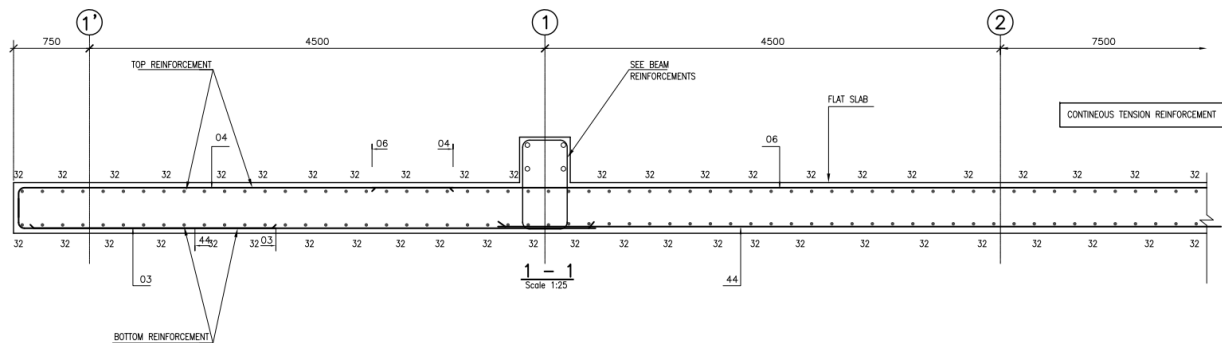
TYPICAL INVERTED FLAT SLAB
